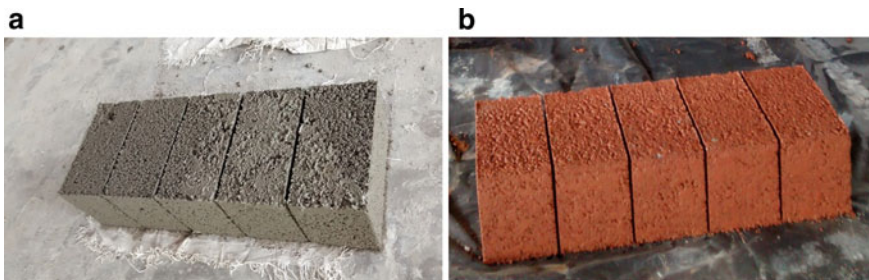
a Cement concrete blocks, b geopolymer concrete blocks
